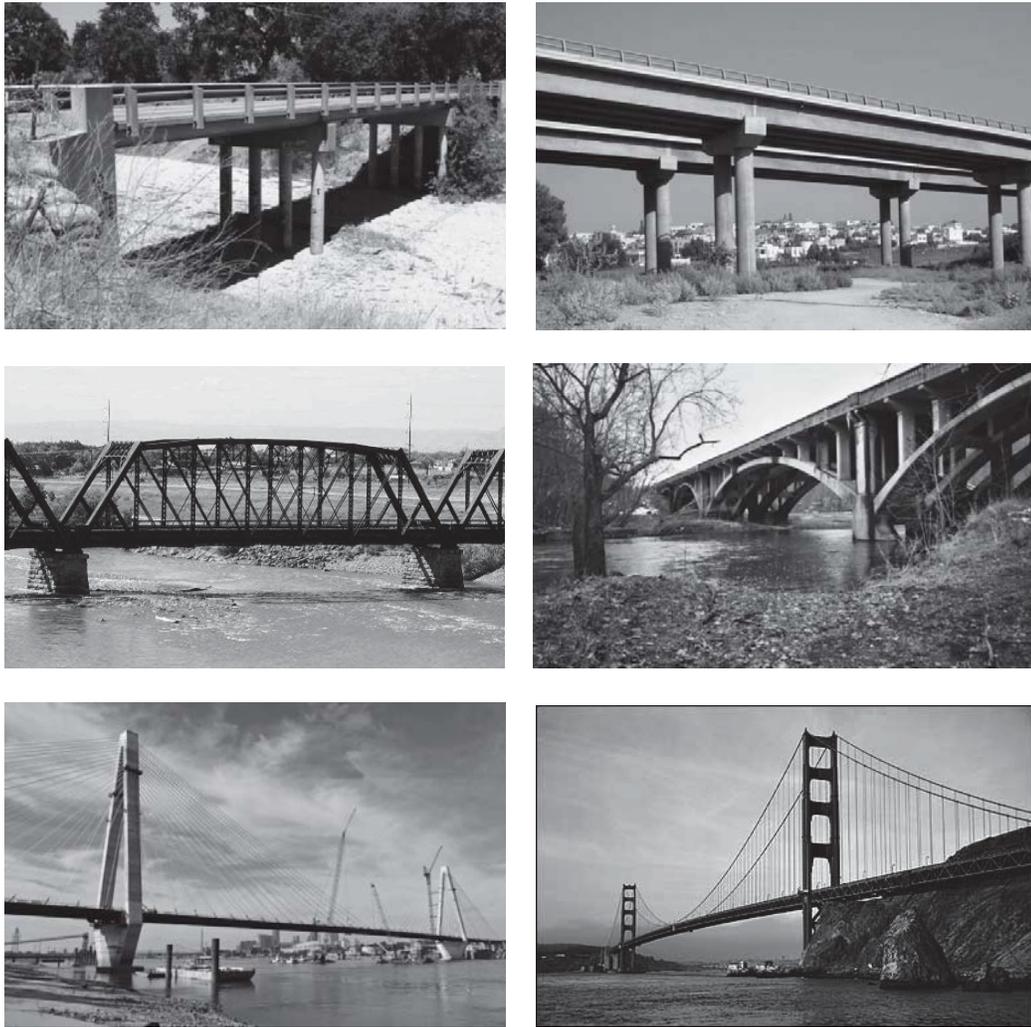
(a) RC solid slab bridge (b) RC girder bridge (c) Steel truss bridge (d) RC arch bridge (e) RC cable stayed bridge (f) Steel suspension bridge.
